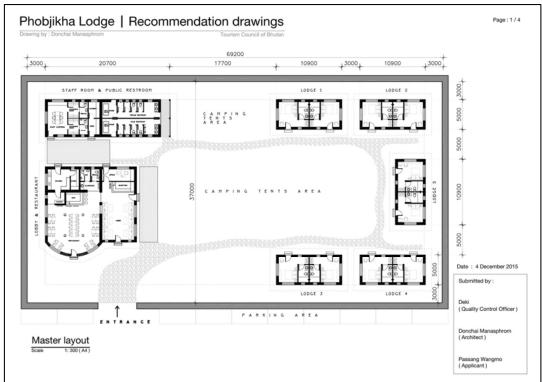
,67. Phobjikha lodge recommendation drawings – Master floor plans
